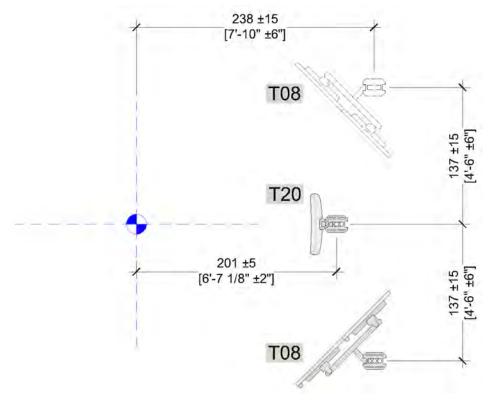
Treatment Room Ceiling Mounted Components (Plan)
